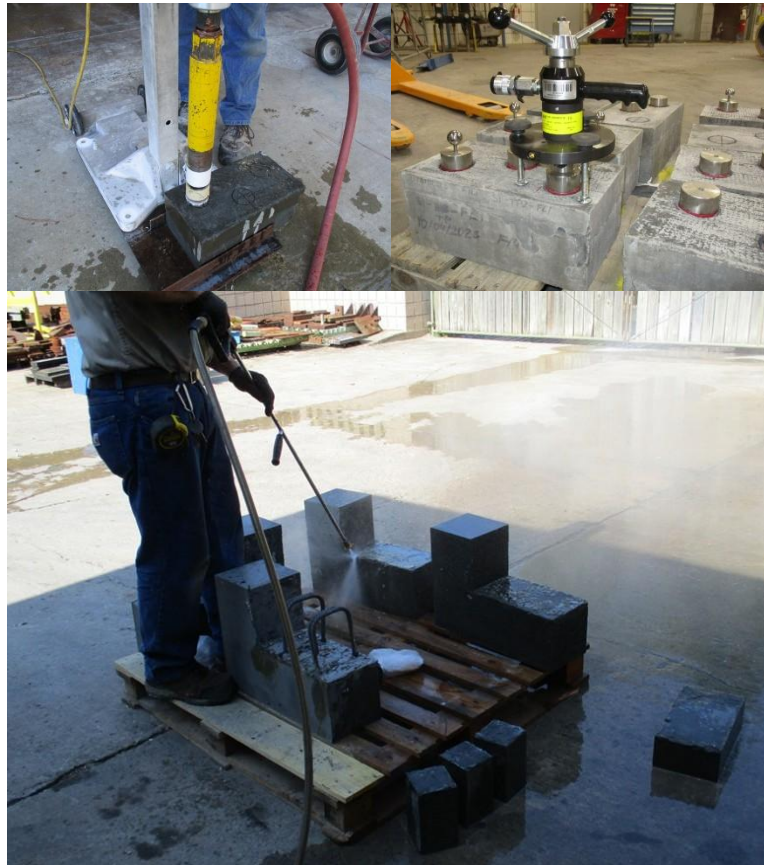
Preparation of specimens for pulloff testing and matchcast testing.
